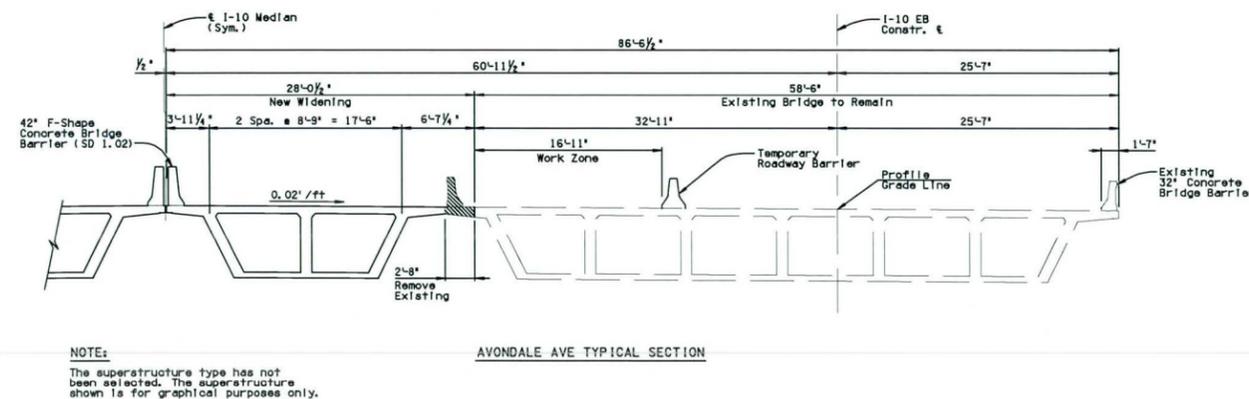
Avondale Boulevard TI OP Typical Section
